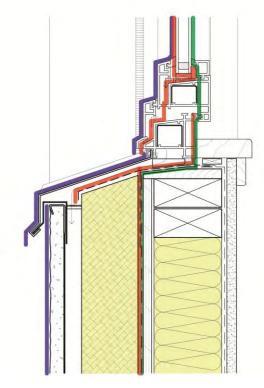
Detail 6-SI – Location of Critical Barriers
